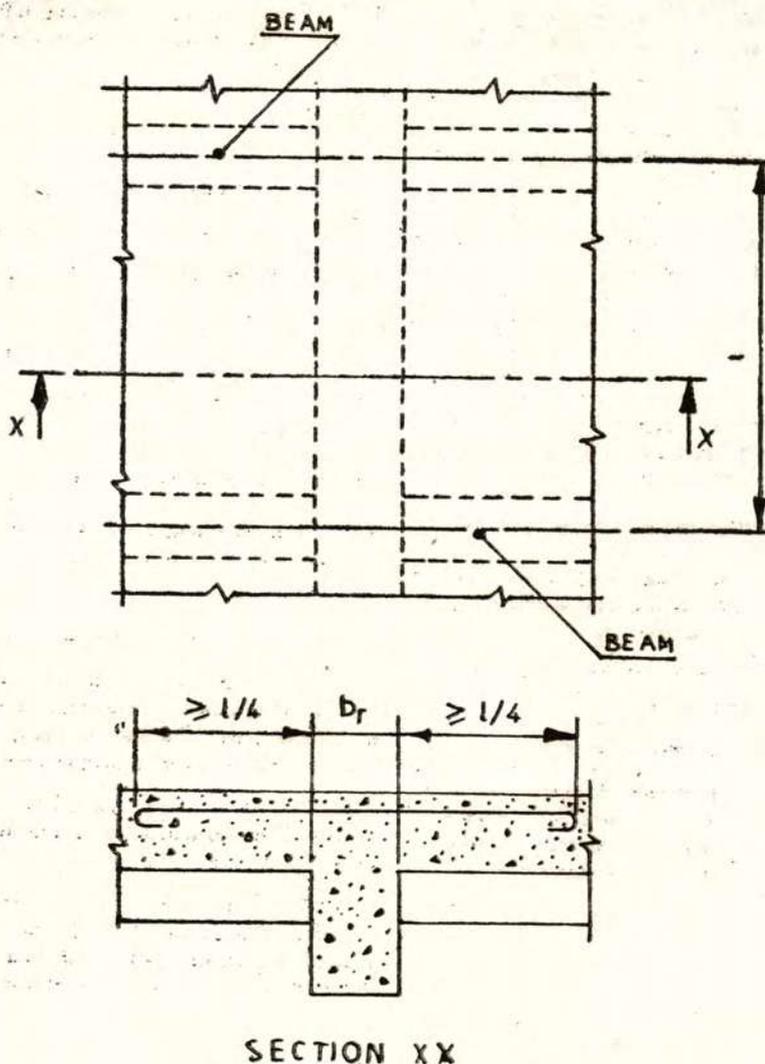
TRANSVERSE REINFORCEMENT IN FLANGE OF T-BEAM WHEN MAIN REINFORCEMENT OF SLAB IS PARALLEL TO THE BEAM
